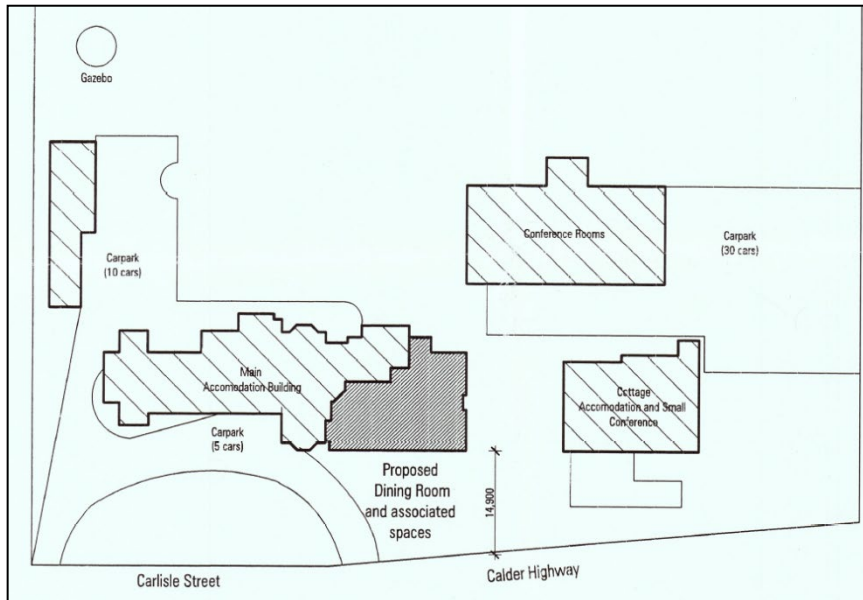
A plan of the site dating to December 1999, illustrating the (then proposed) large addition to the south-west corner of the building, and other extant buildings on the site. North is left (MRSC PF).
